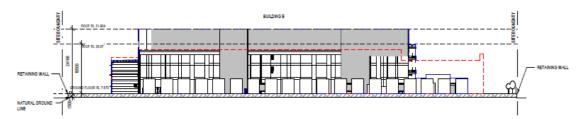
Western elevation of Building B Source: Greenbox Architecture
